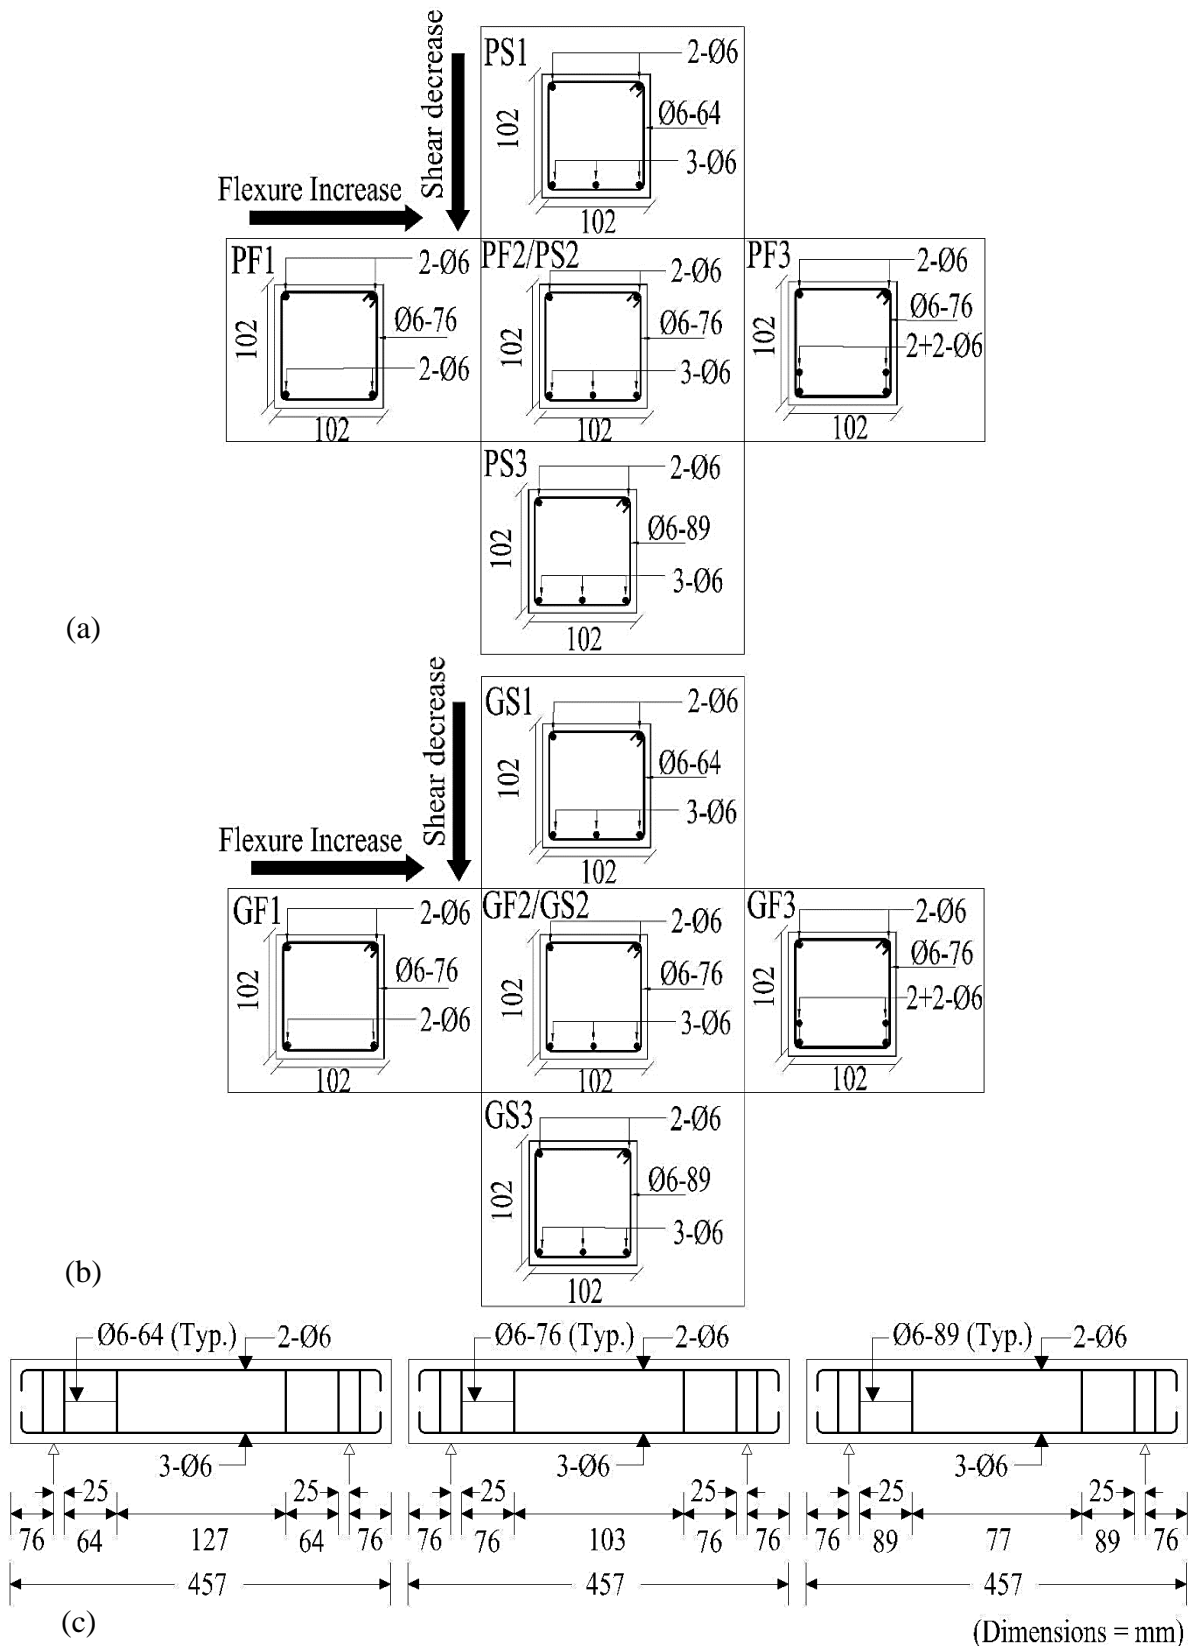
Structural details of beam-lets with steel rebars: (a) cross-sections of PC, (b) cross-sections of GFRC, and (c) elevation of beam-lets with a decrease in shear reinforcement
